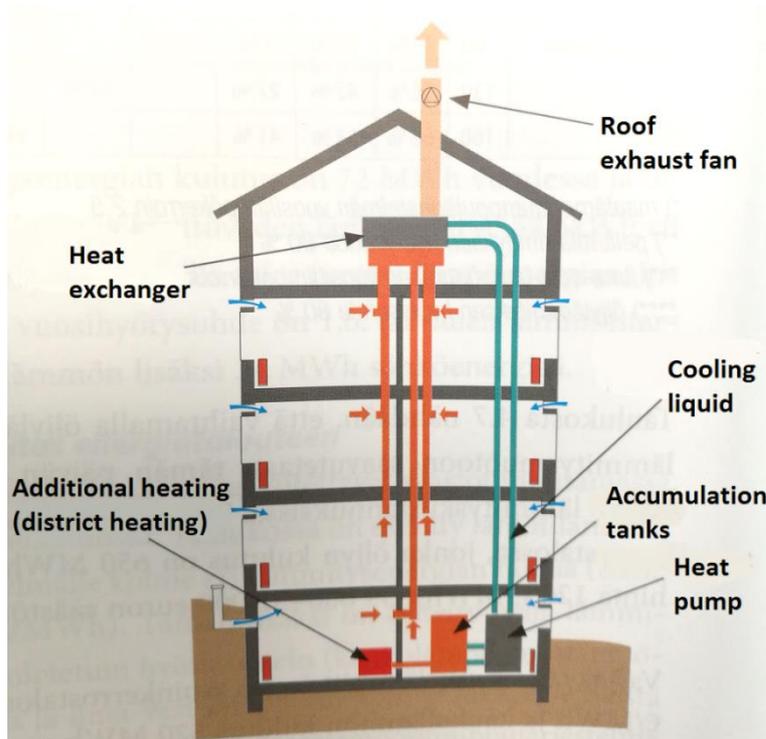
EAHP in an apartment building with mechanical exhaust ventilation system. Modified after (Virta & Pylsy 2011, 124).
